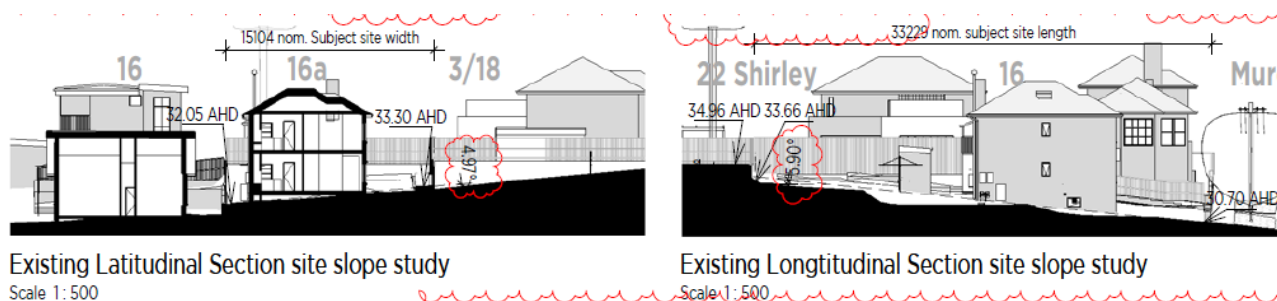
Plans showing the extent of slope across the site both in east -west direction and a north - south direction.
